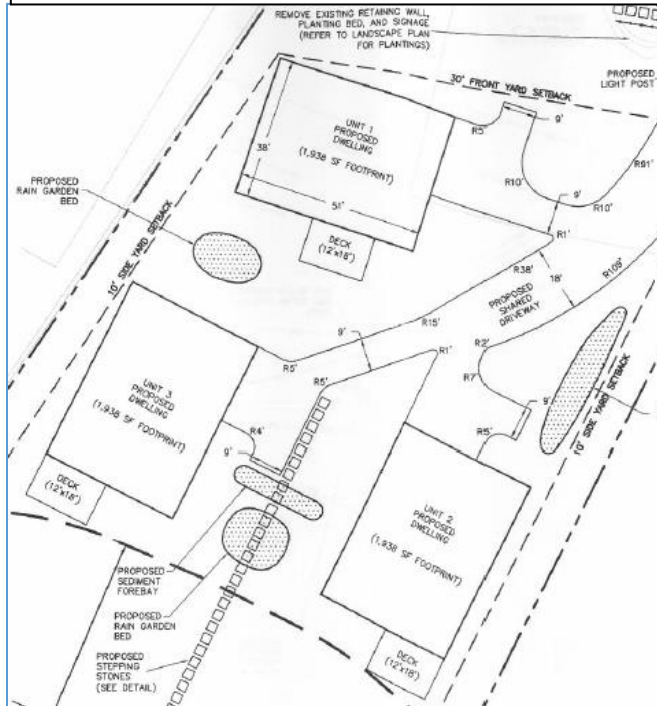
Plan submitted to the Planning Board on November 16, 2016 showing final layout
